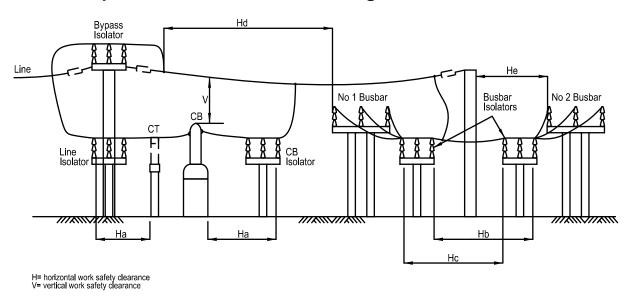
WORK SECTIONS IN DUPLICATE - BUSBAR INSTALLATION
